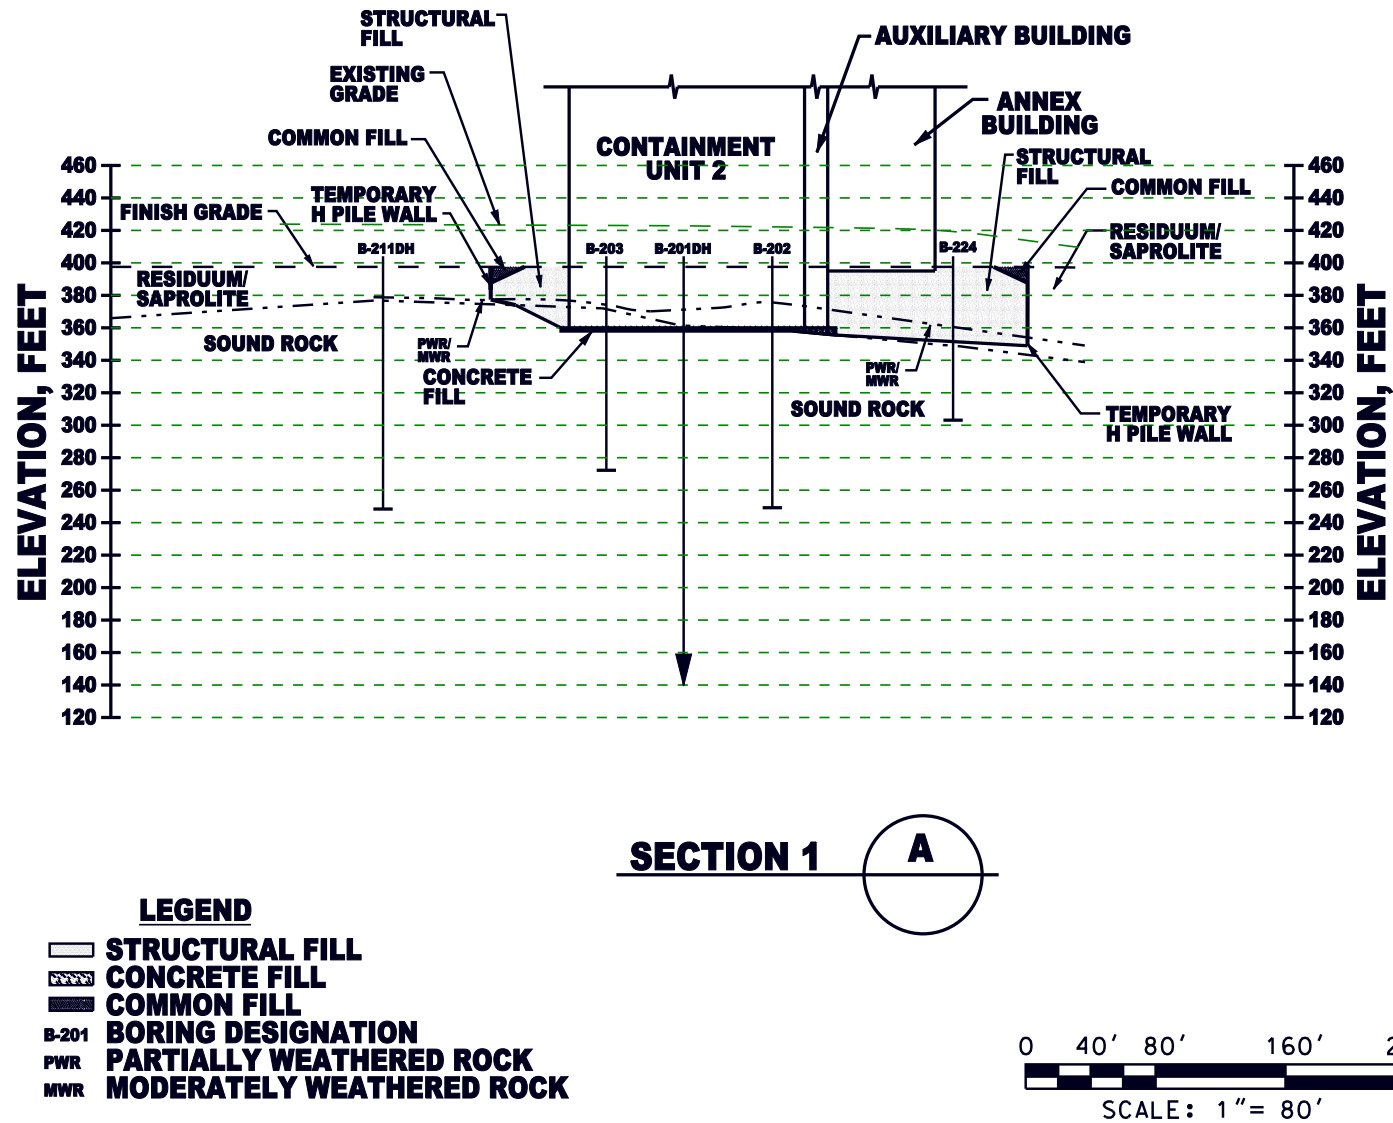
Cross-Section of Structure Foundation A-A
